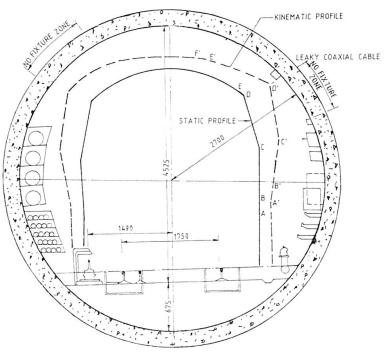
Typical Cross-section of Tunnel in Rock Tunneling
